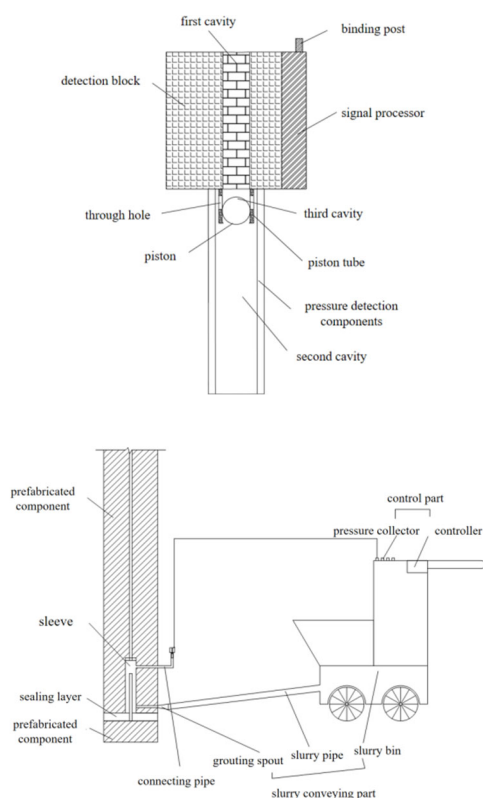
Cross-sectional view of the grouting pressure detection plug of the grout sleeve. Fig. 9. grouting equipment of grout sleeve.
